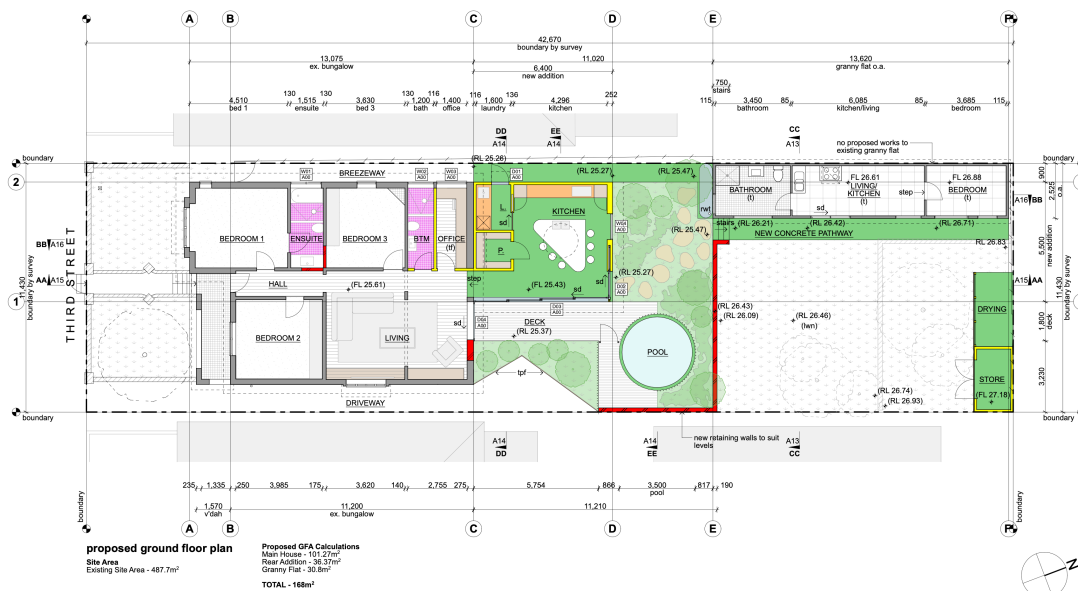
Proposed Ground Floor Plan (Source: SWAD) - Not to Scale
